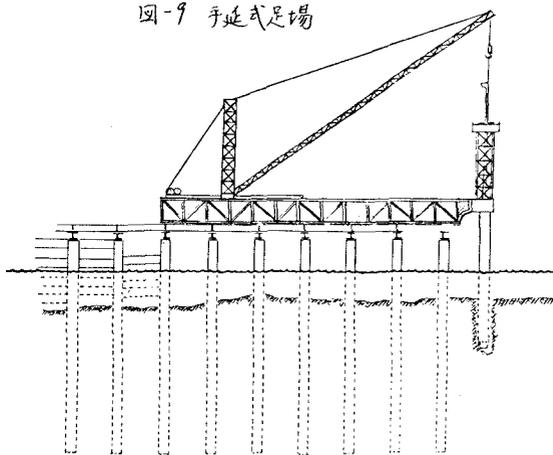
Under-construction of the Working Platform by the Traveling Girder
